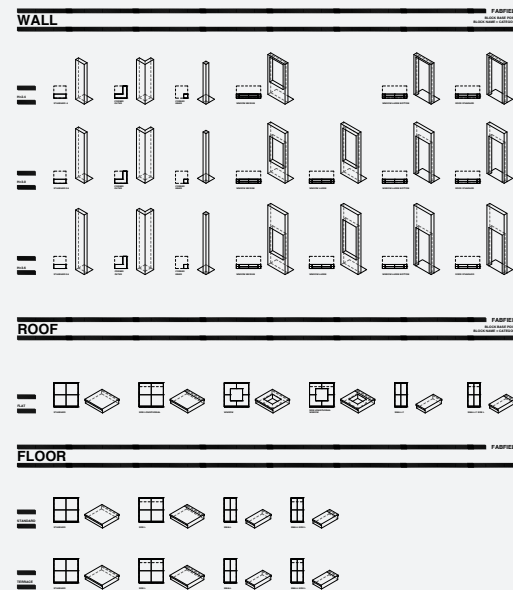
Building system EConnect (Pieter Stoutjesdijk)
